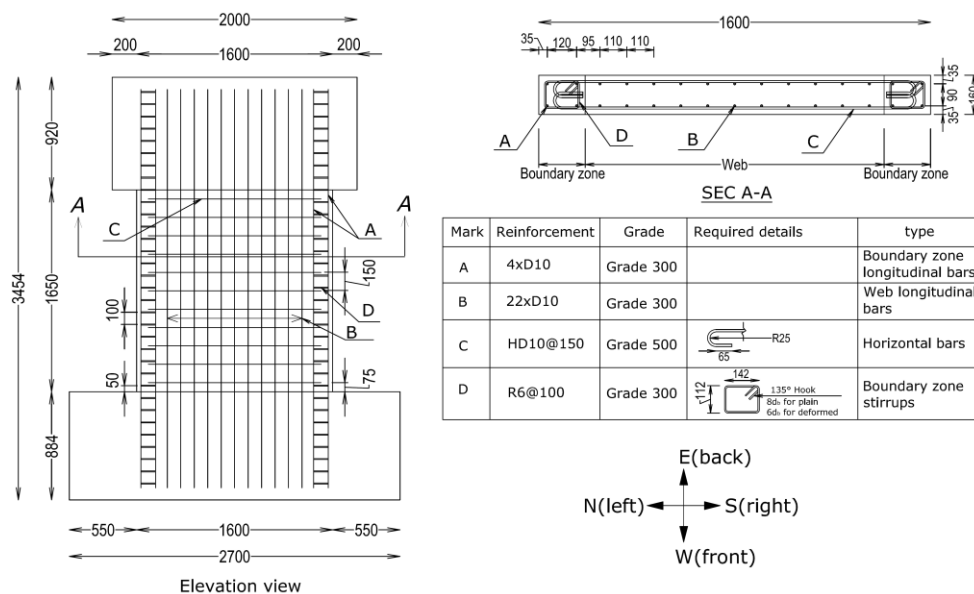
Details of the section and side view of the reinforcement layouts of the specimen SP2-ND
